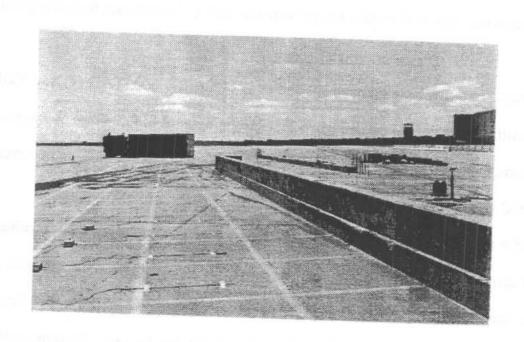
Retrofit Concrete Barrier Rail Damage, Test I4-1.
